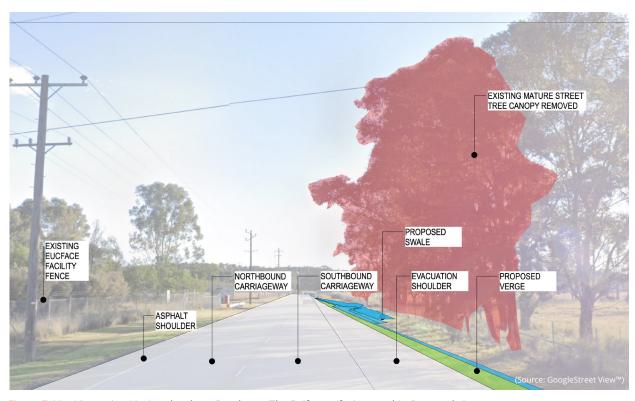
Viewpoint 11 - Londonderry Road near The Driftway (facing north) - Proposal view
